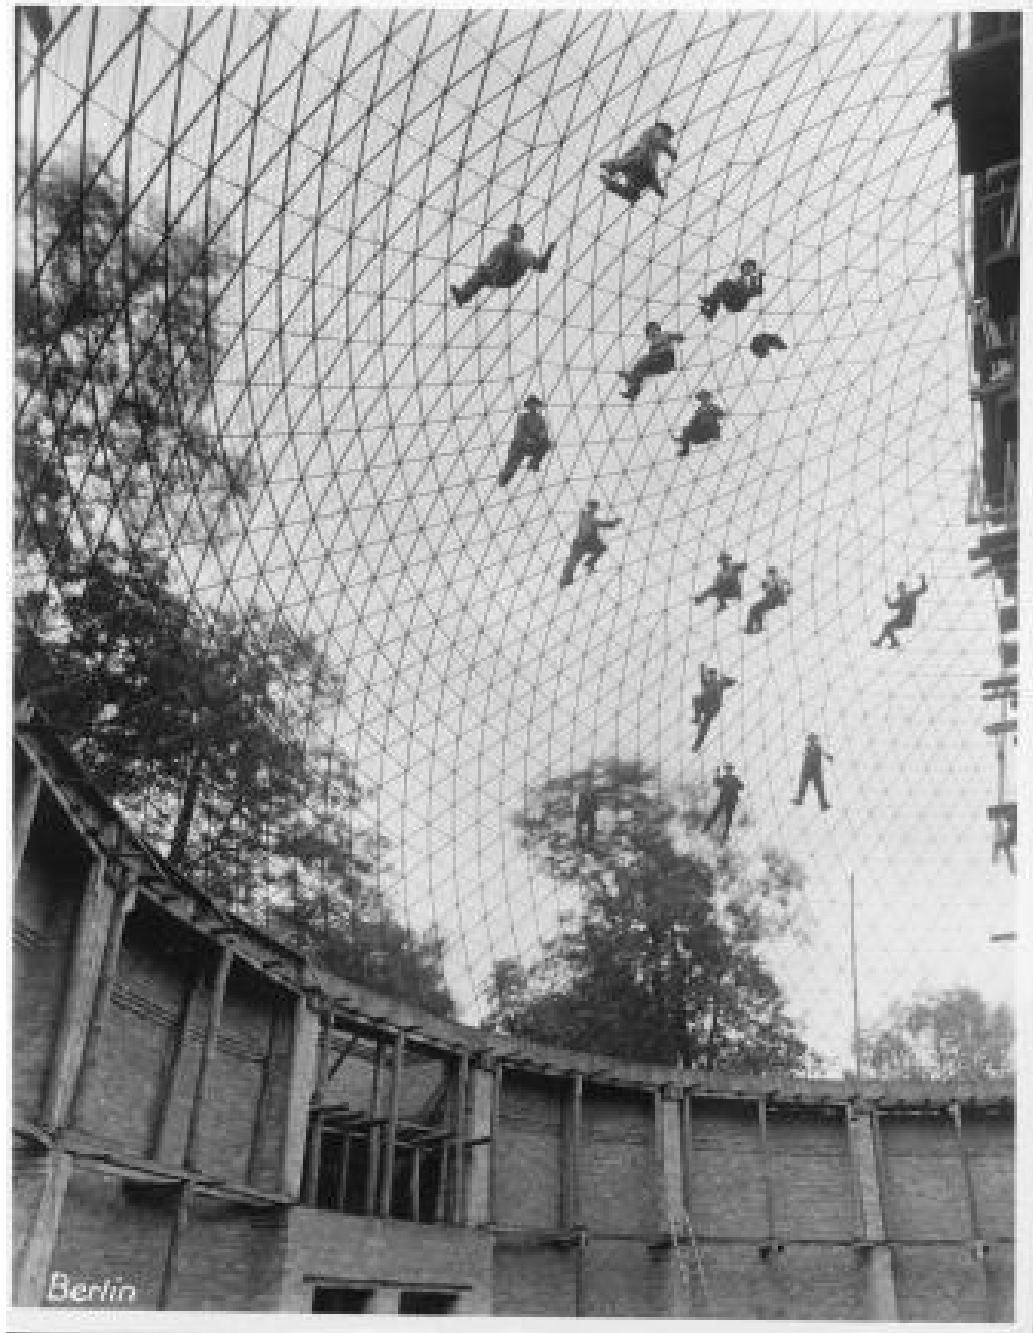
Workers stretching dome network at the Berlin planetarium construction site. Courtesy Carl Zeiss Archive.
